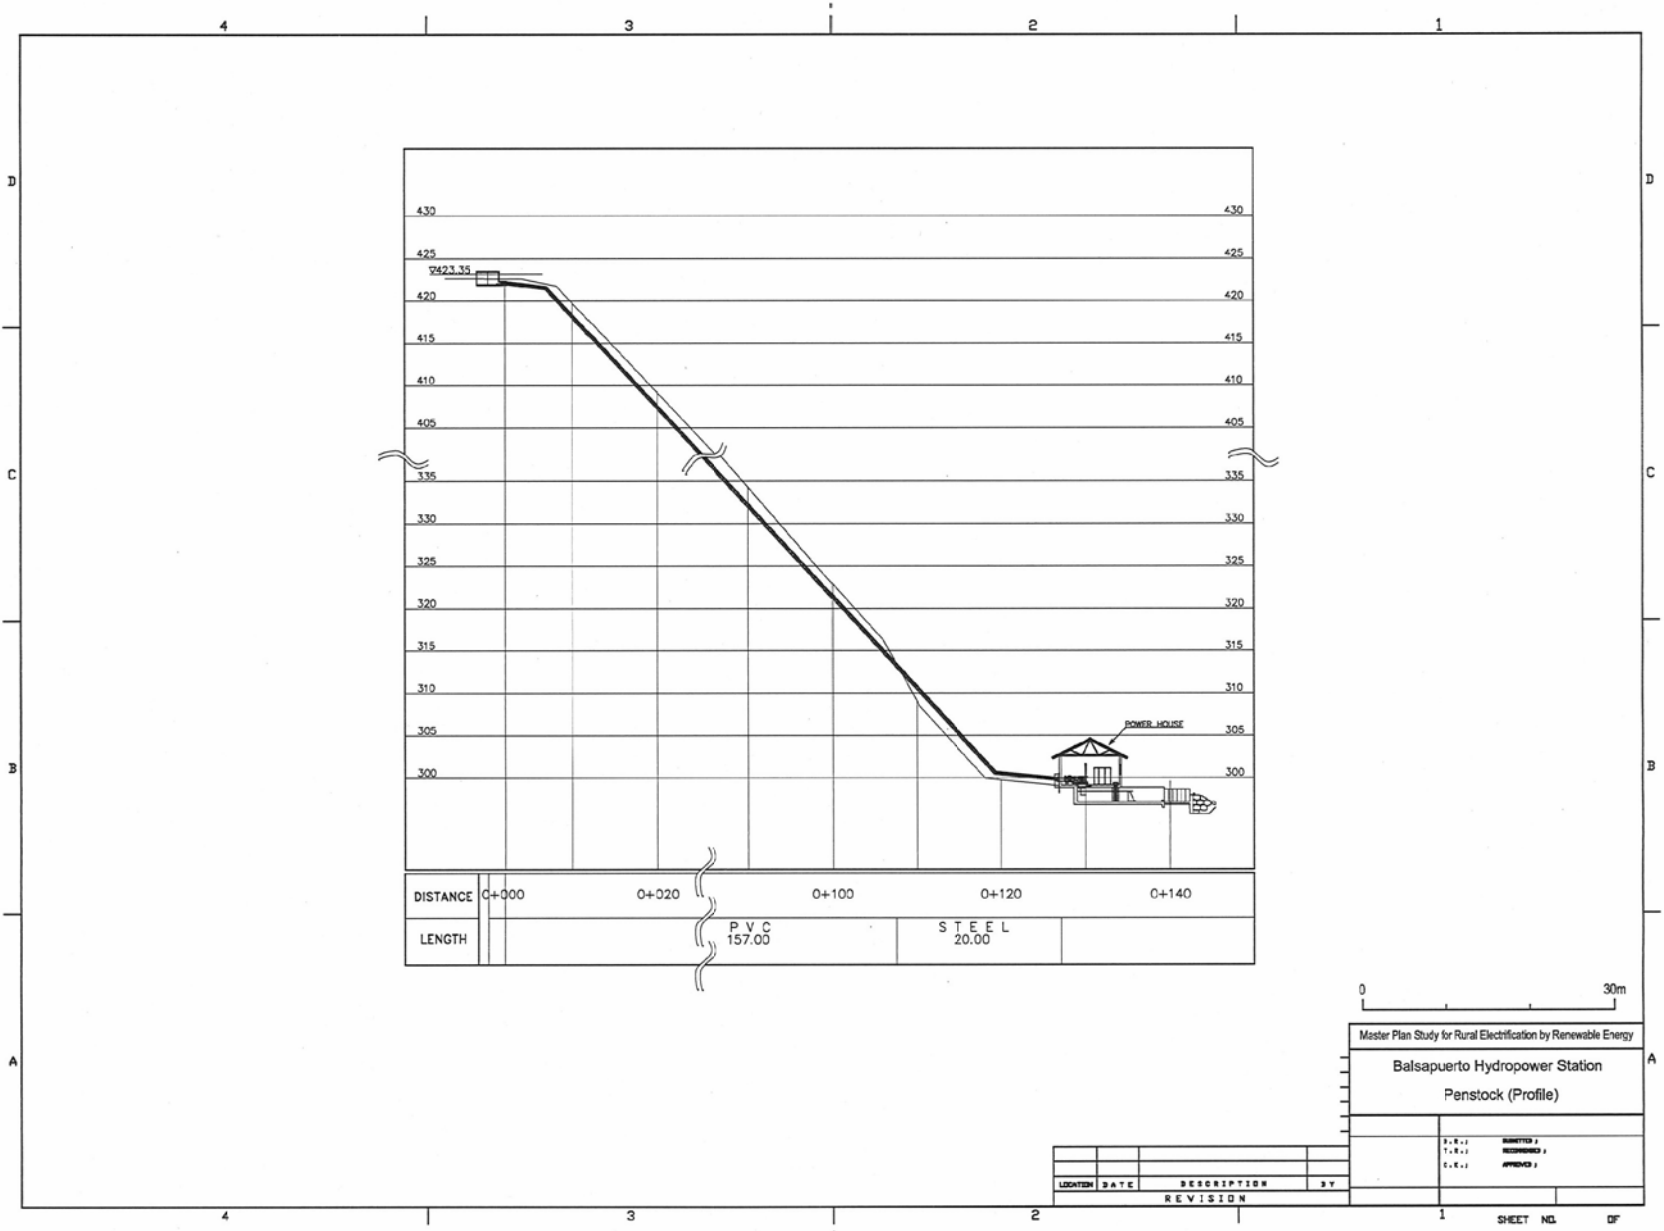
Rough Design Drawings of Penstock (Profile)
